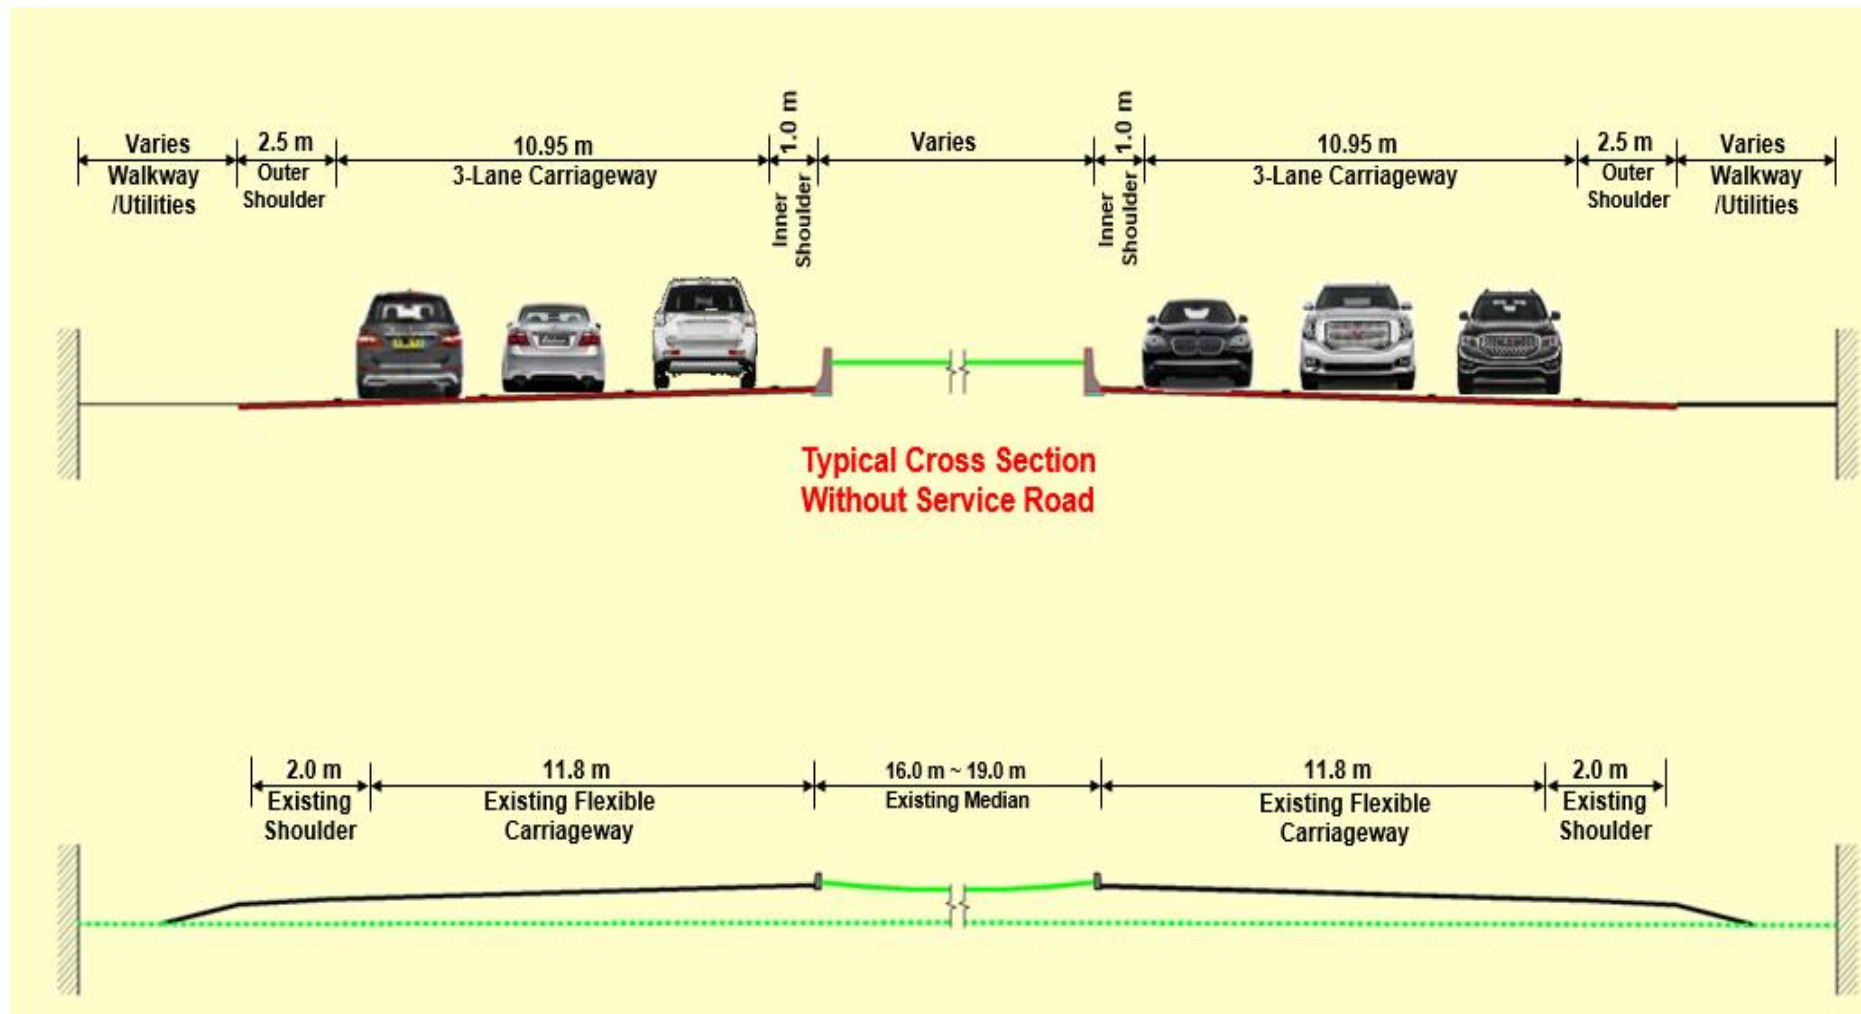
Typical Cross Section of the 3 Lane Road Without Service Road
